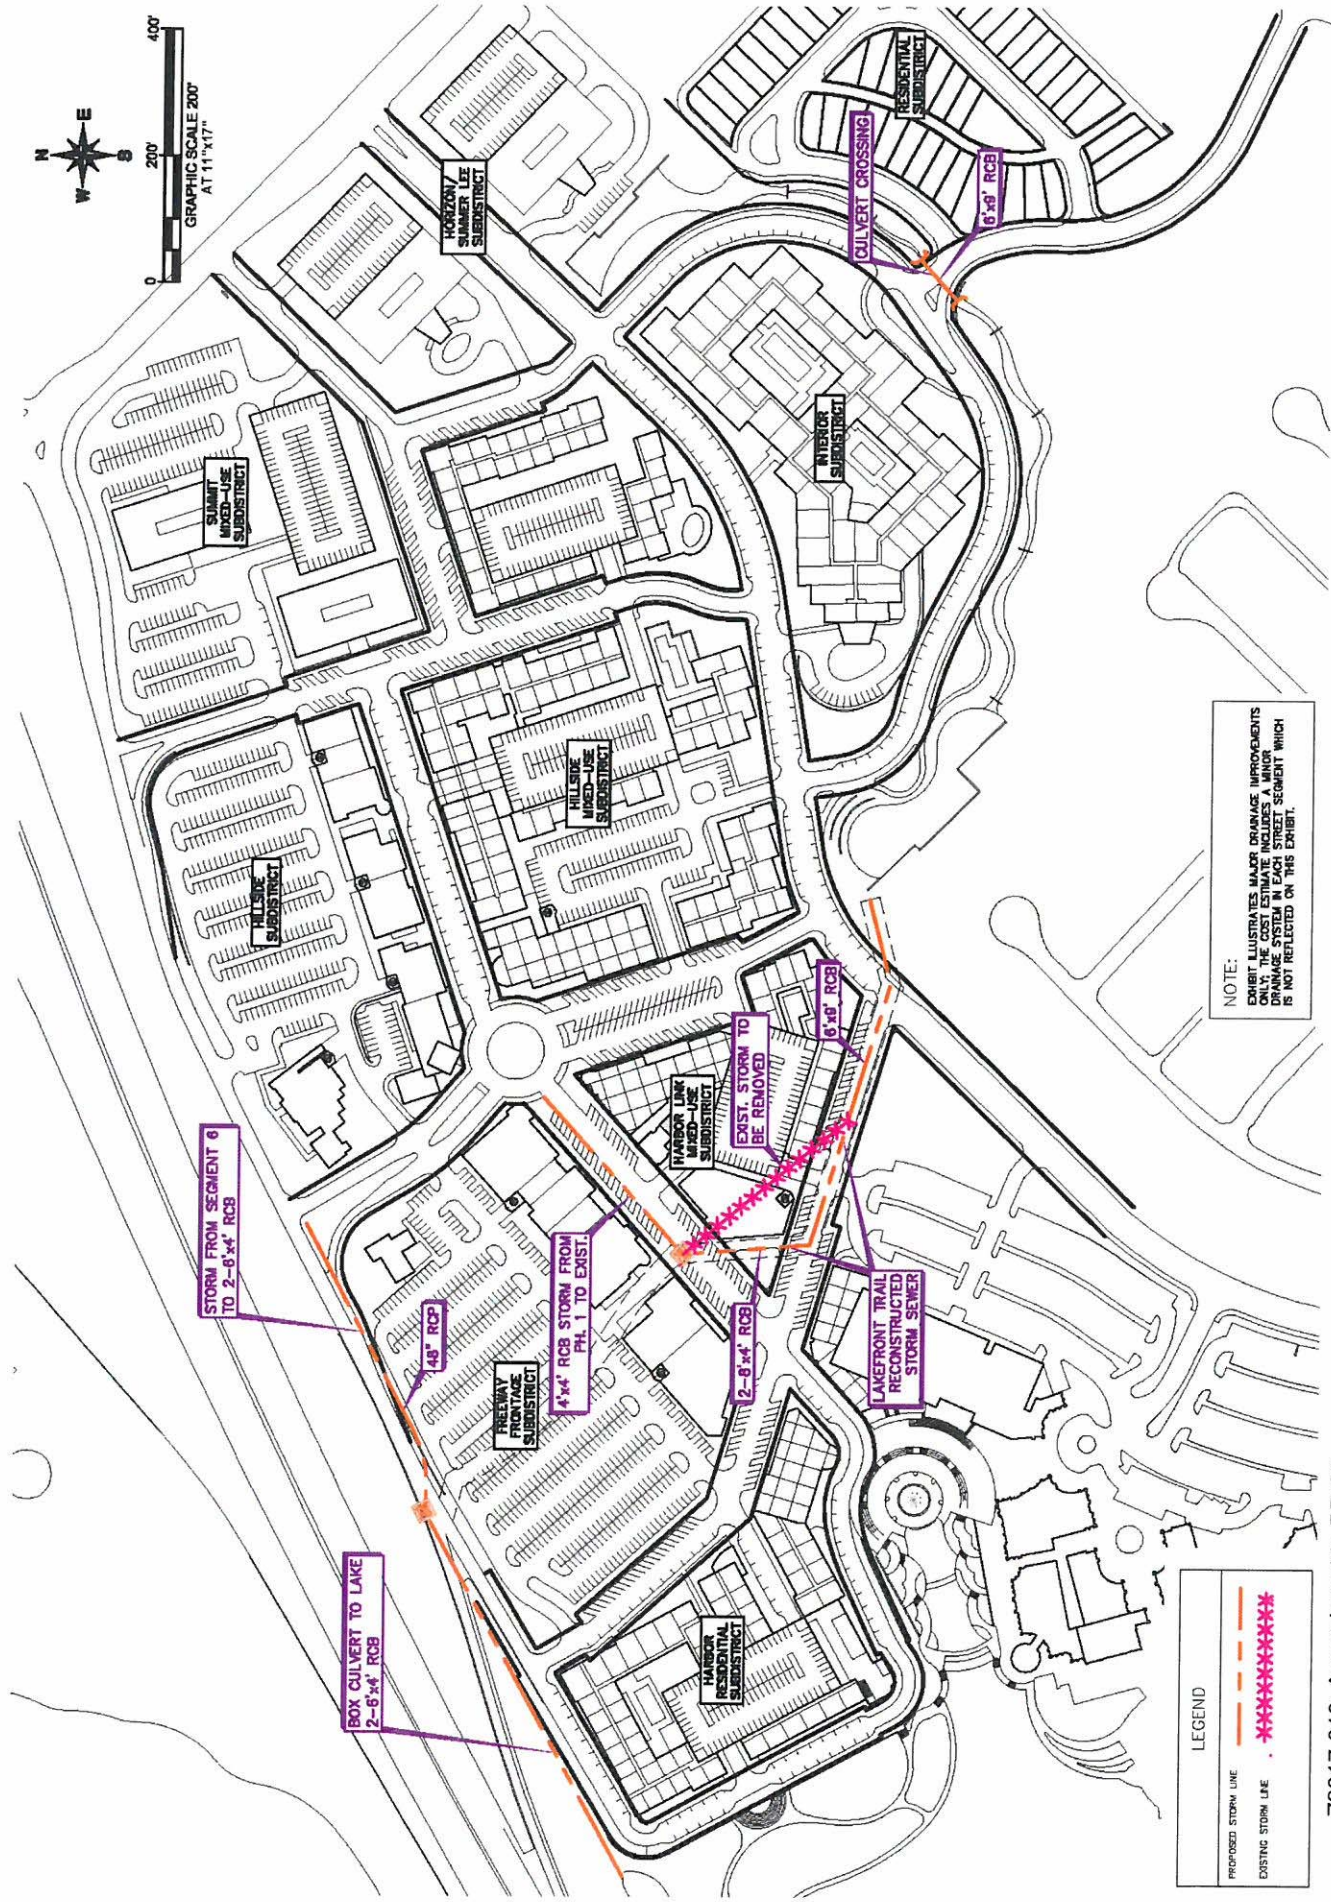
': Proposed Drainage Improvements Plan
